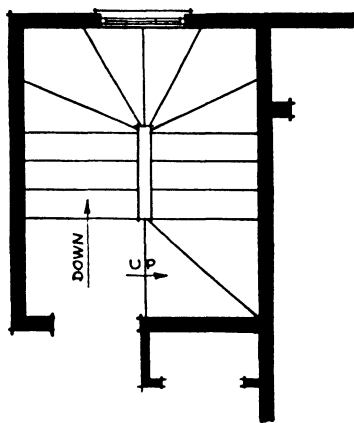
Plan of a Stair Fitted into a Rectangular Space
